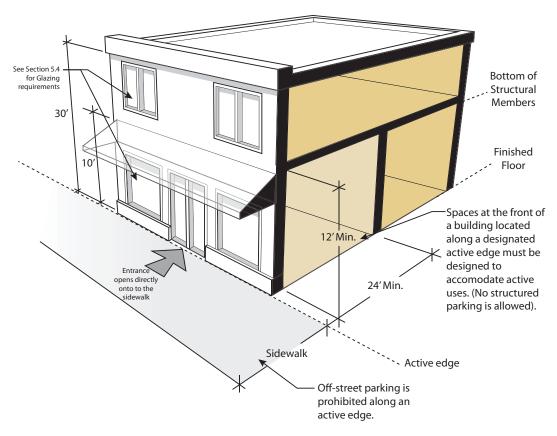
Illustration showing required active use area along an Active Edge. Parking is not allowed between the street and building frontage along an Active Edge.
